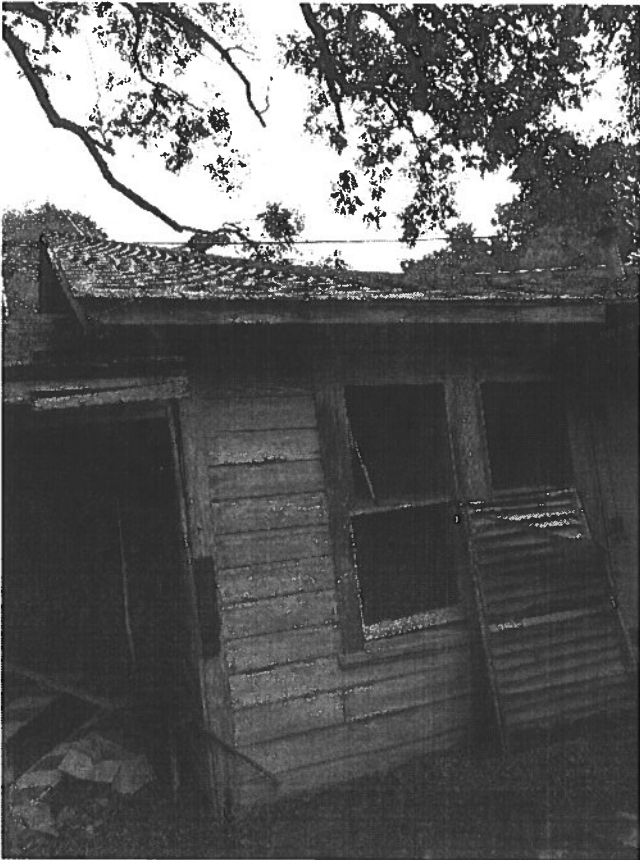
Ridge Beam Broken, Fascia Deteriorated, Composite Roof Deteriorated
